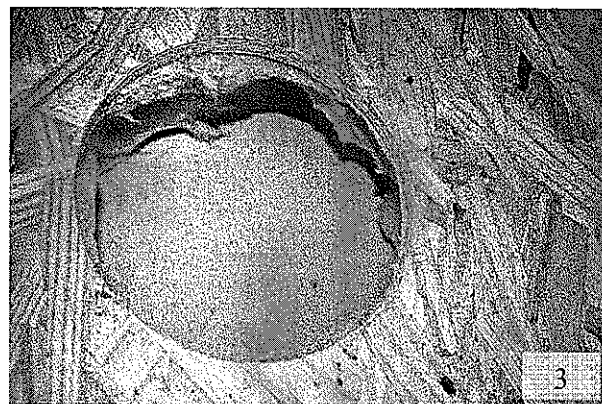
Living room wall cavity -MS (10-24-07) ■8- sample location at exterior wall near the porch light penetration. The exposed wallboard, wood framing and batt insulation are in like-new, pristine condition. Wall cavity observation was Condition 1 or "normal fungal ecology" and no adverse fungal evidence was present that suggests that the walls need or will need replacement. Evidence of the Healthy Homes wall check test is seen as the holes penetrating the interior wallboard. (HHR 5-22-06) ✕3.
